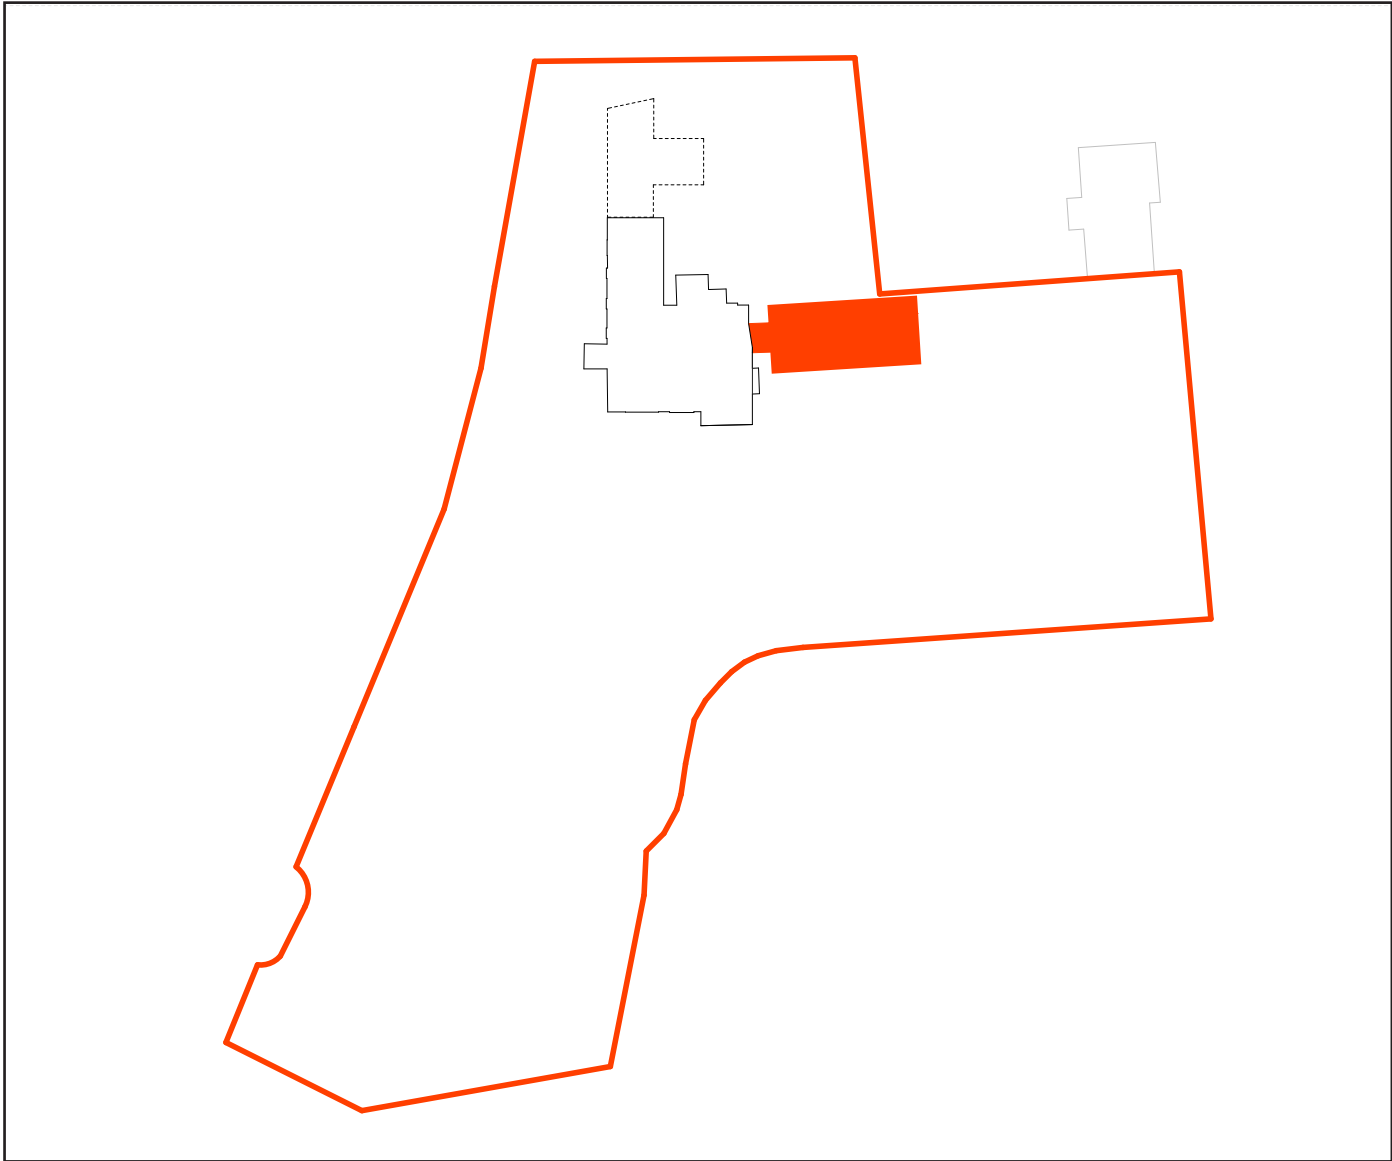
Site Diagram Depicting Site Boundary & Existing Buildings alongside the proposed extension
